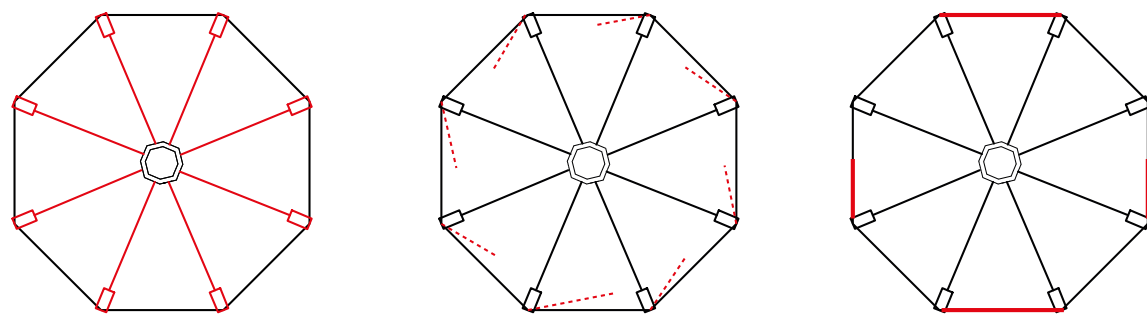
Preventing rotation of the structural frames by placing the stabilization walls.
